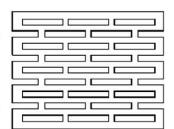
Lightweight concrete masonry units — Geometry 3/1,2
